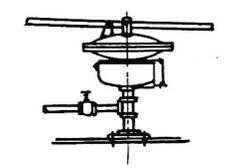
Alternate mounting of Webster Damper Regulator. Steam connection at bottom
